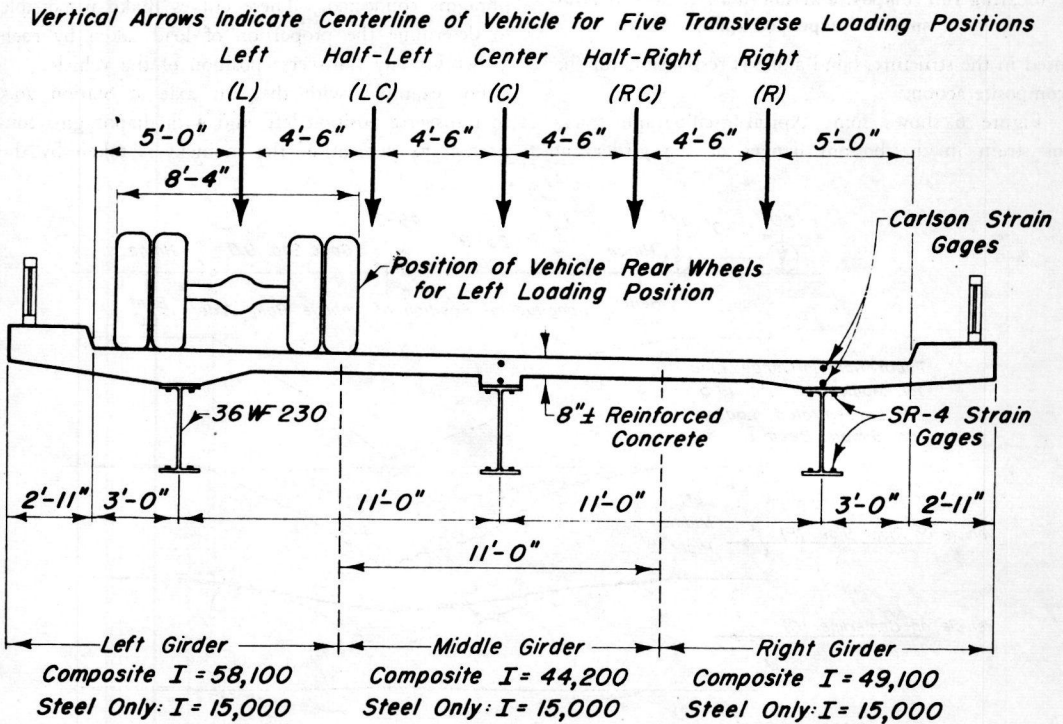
Cross section of bridge at gage Stations 19.5 and 20.5, showing composite sections, strain gages, and transverse loading positions.
